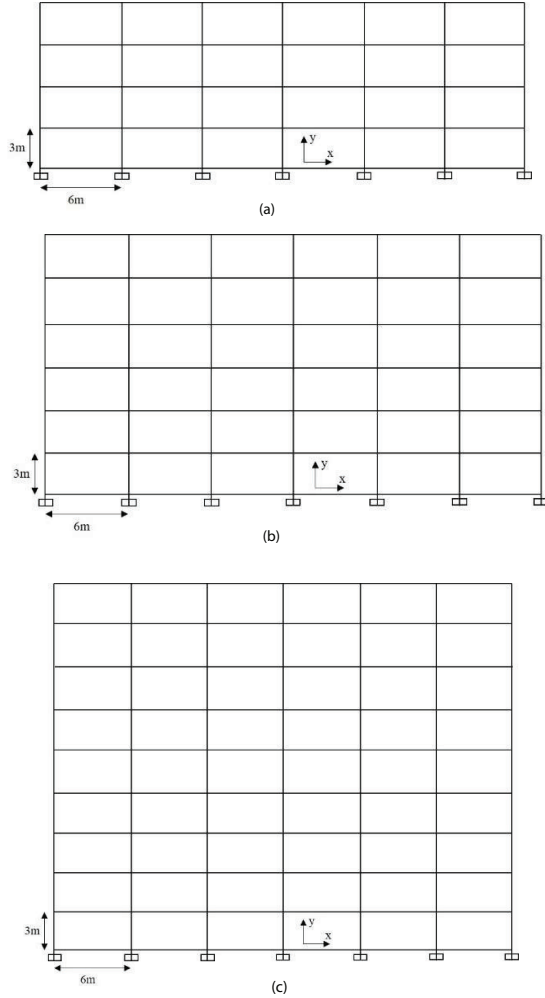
Moment resisting frame (MRF) elevation view (a) 4-storey frame; (b) 6-storey frame; and (c) 9-storey frame
